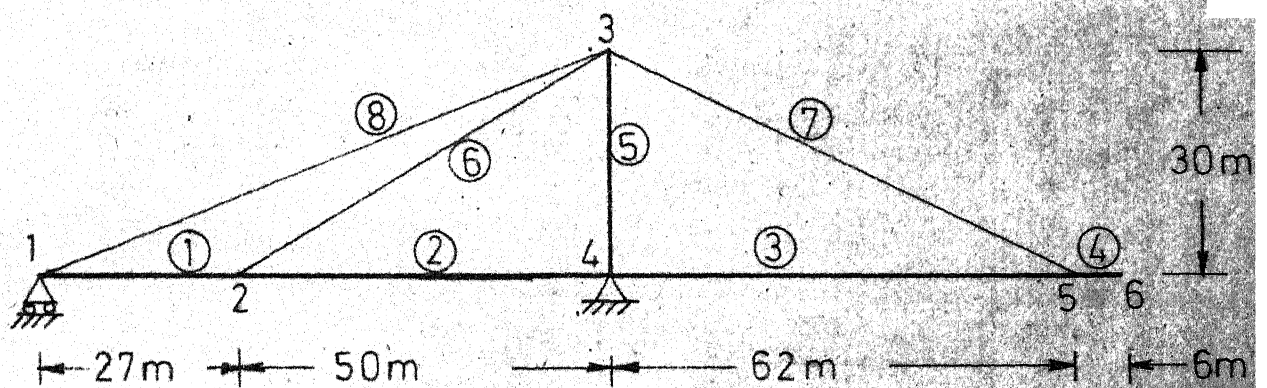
SYMMETRIC CABLE STAYED GIRDER BRIDGE
